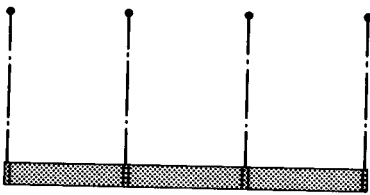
System with four vertical cable planes positioned outside and between three separate traffic areas
